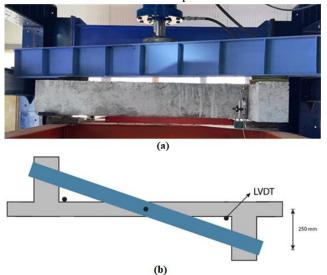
Torsional test setup, (a) Elevation, (b) Plan.
